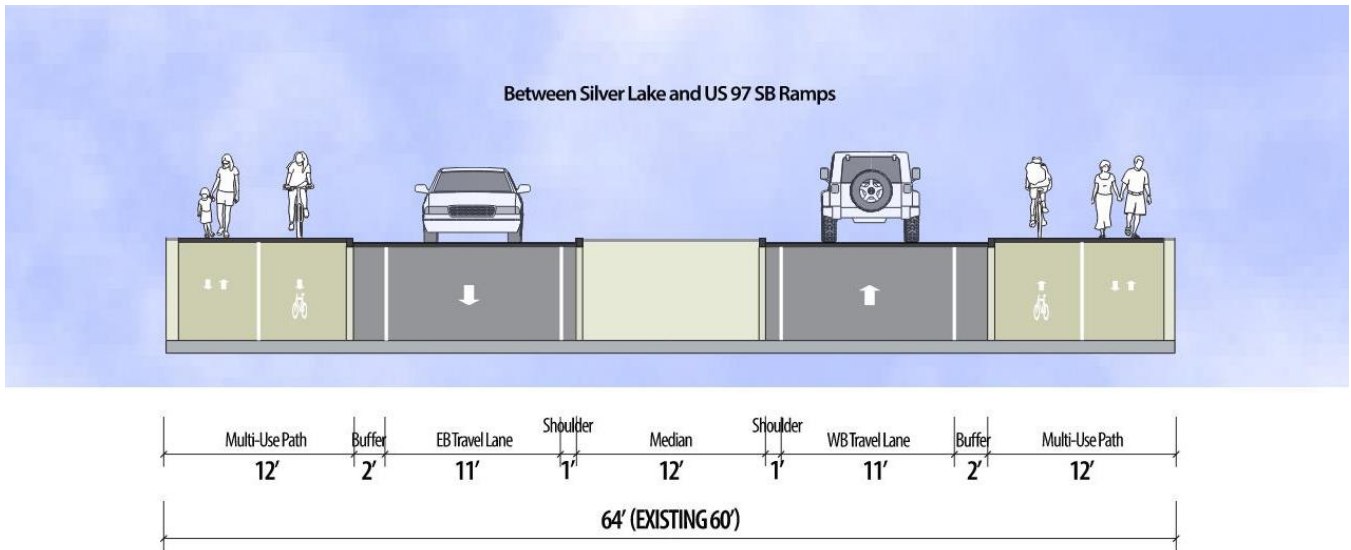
POTENTIAL LONG-TERM REED MARKET ROAD CROSS SECTION (BETWEEN SILVER LAKE BOULEVARD AND US 97 SOUTHBOUND RAMPS)
